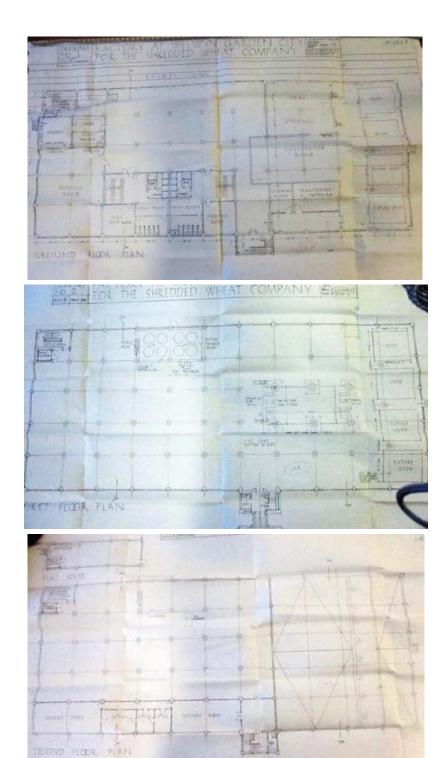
and 15: Ground and first floor plan of the original factory building. Figure 16: Second floor plan of the original factory building.
